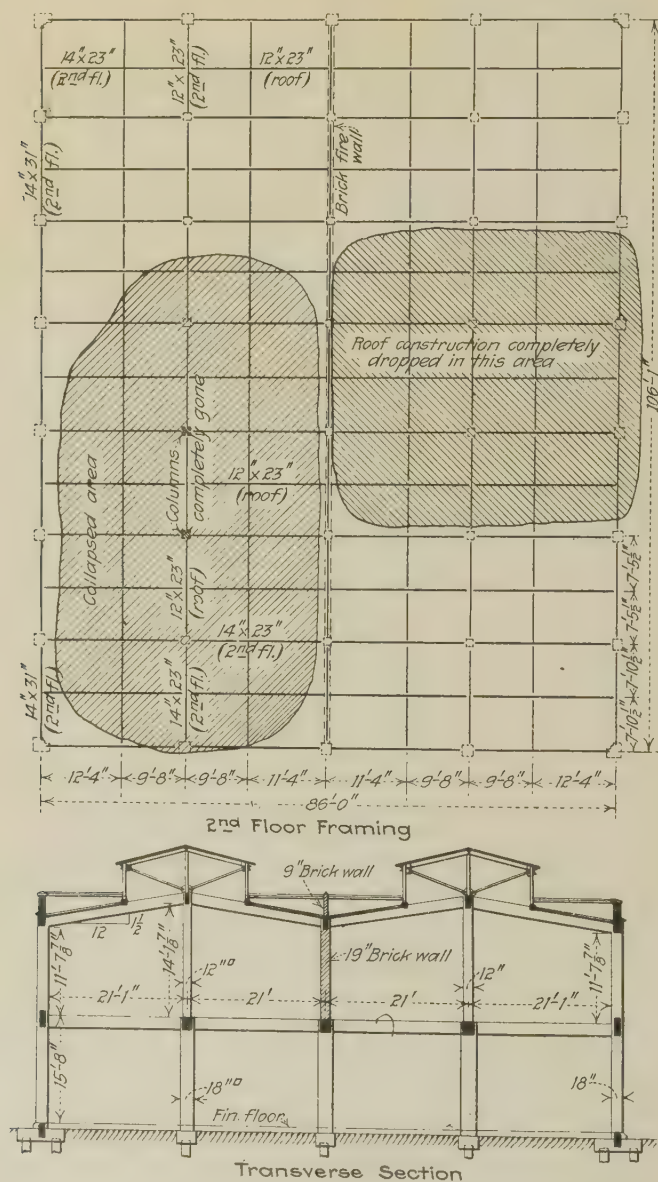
PLAN AND SECTION THROUGH NAPHTHALIN BUILDING WHICH BURNED.
